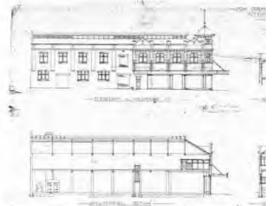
Original architectural design drawings for Sutton Forest Meat Lindsay Thompson Architect, 1910. Note alternative roof design and con Sydney City Archives, Building Application plans 0221/10)
